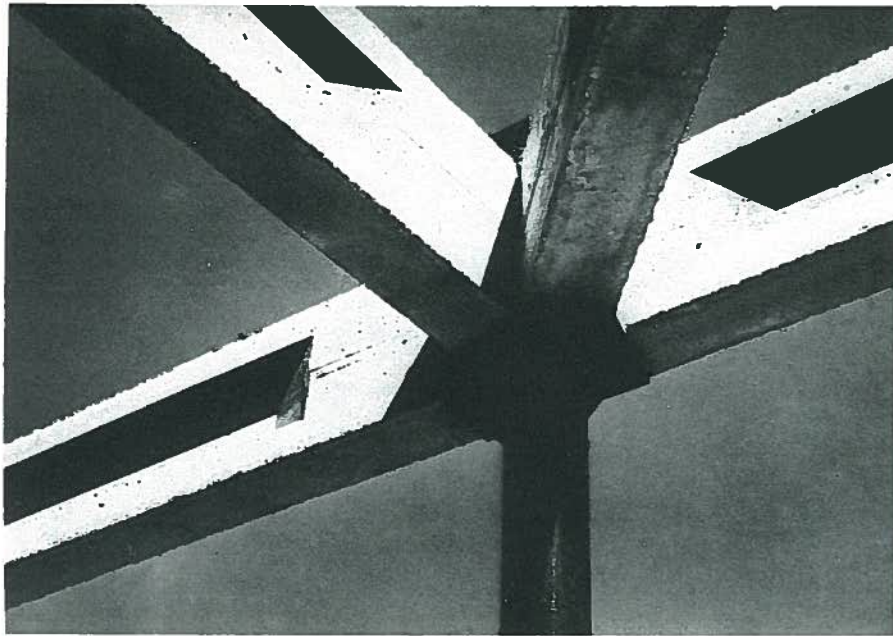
Working around the tolerances of concrete, Prestressed Concrete of Colorado connected four beams into one column.
